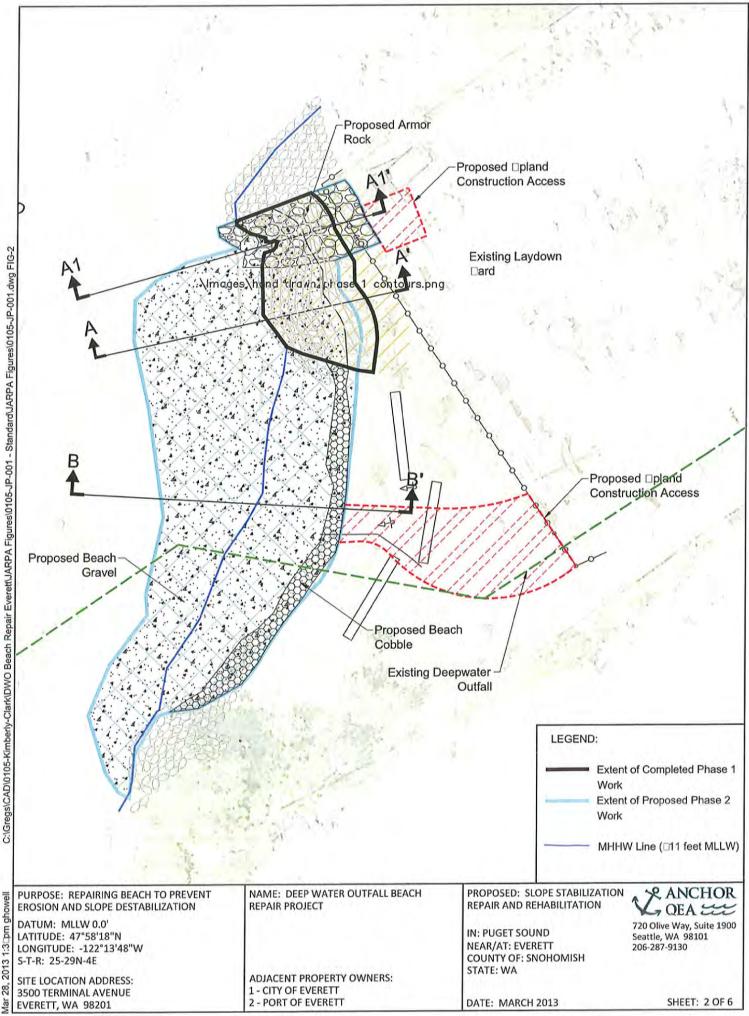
Plan View, Phase 1 Deep Water Outfall Beach Repair Project
